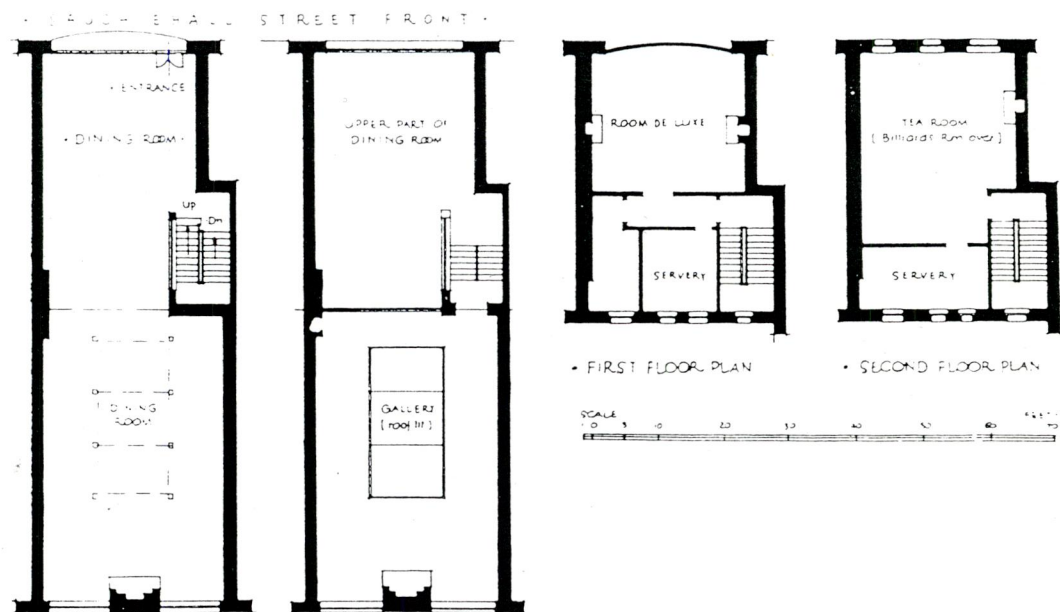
1904-5. Plans of *The Willow* Tea-Rooms, Sauchiehall Street, Glasgow.
